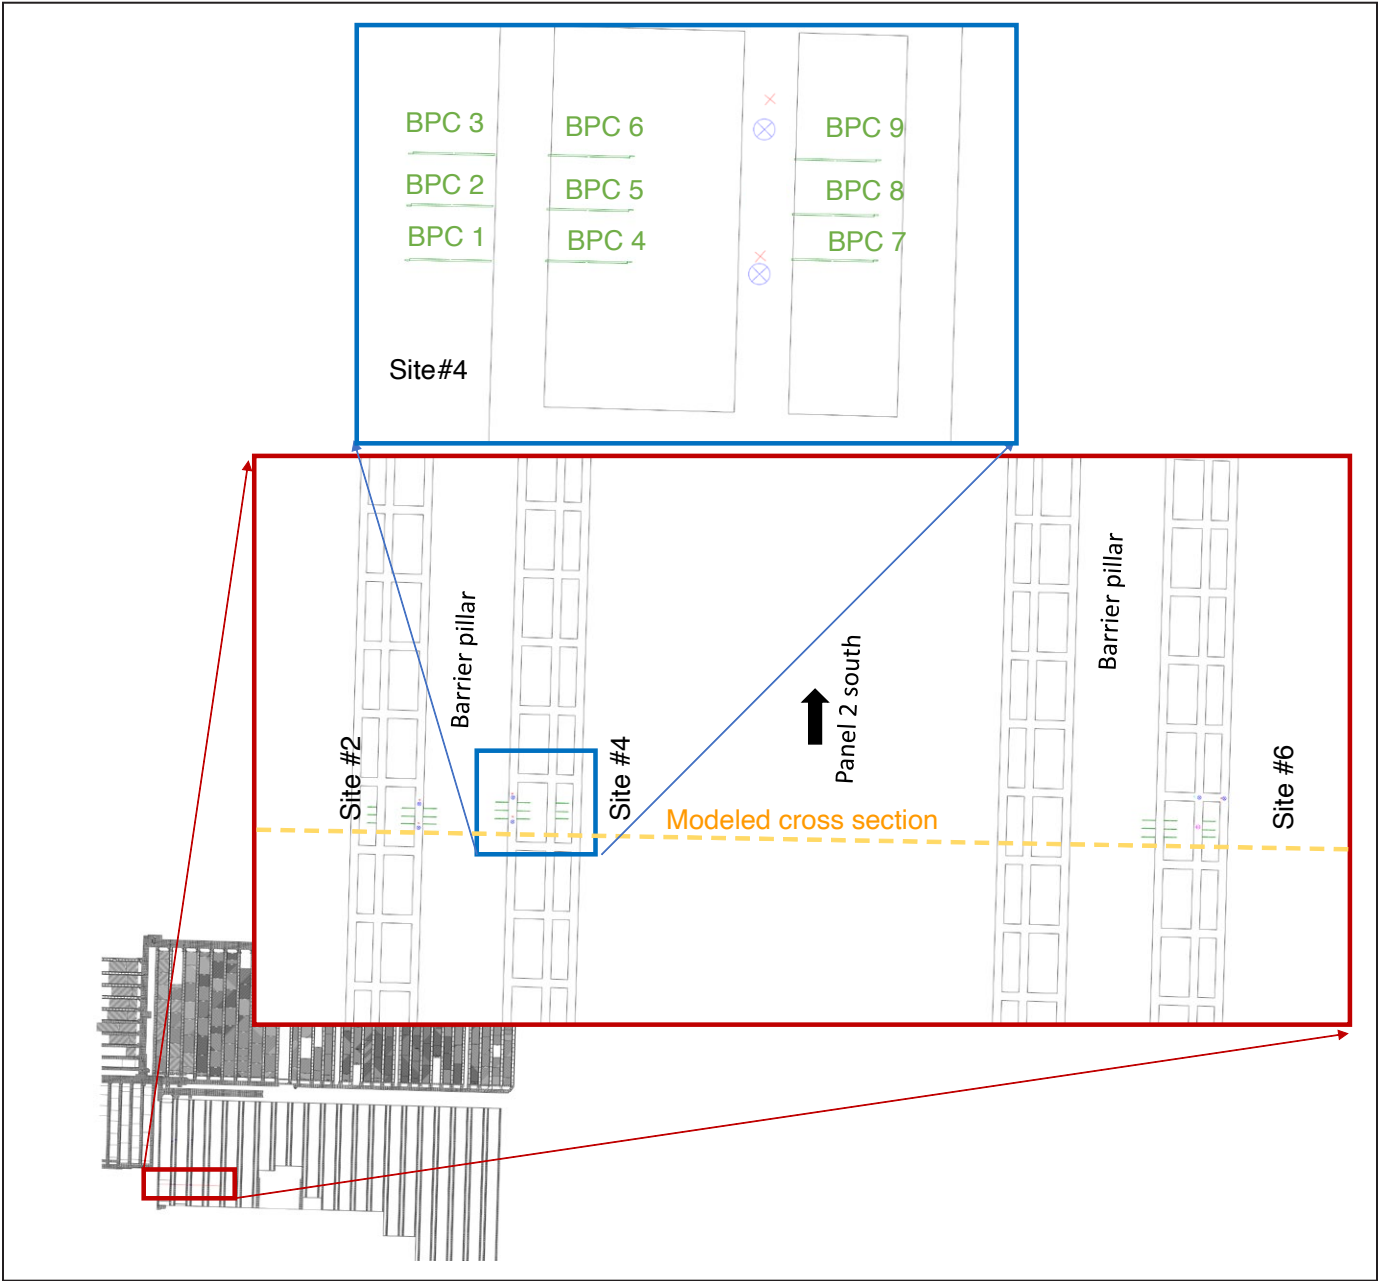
Mine layout, instrumentation sites, and modeled cross section
